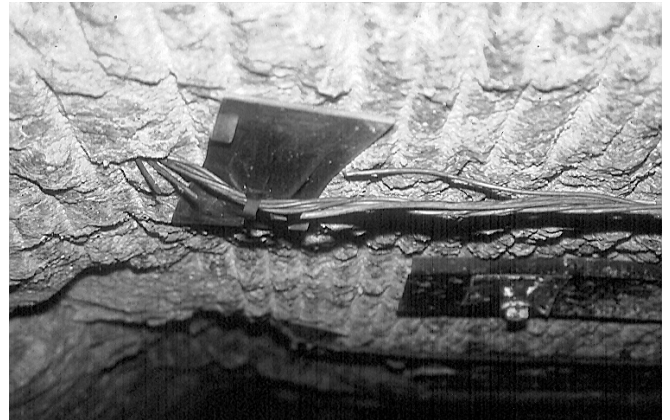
Cable sling failure in mine entry subjected to vertical and horizontal loading.
